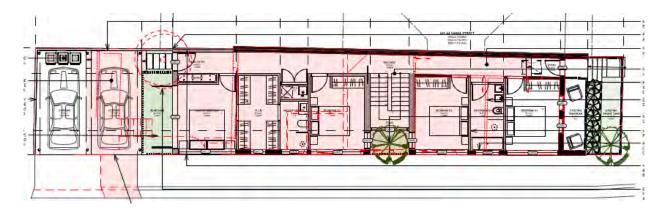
Ground Floor Plan demonstrating the proposed building footprint
